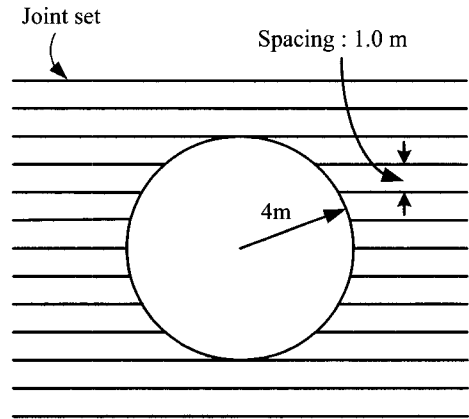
Circular tunnel excavated in rock mass containing single joint set
